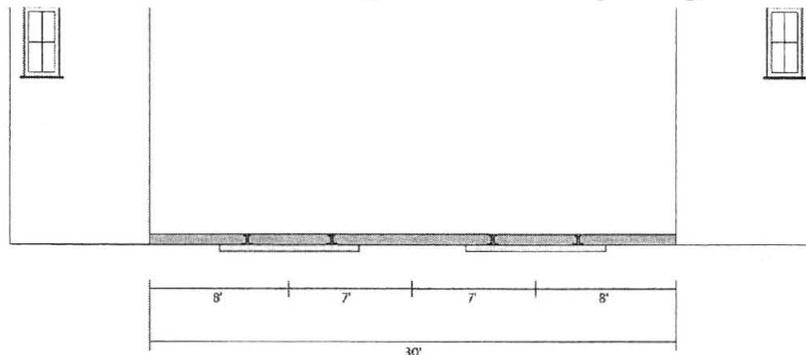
Light Rail Running Behind Development – Newark, New Jersey
